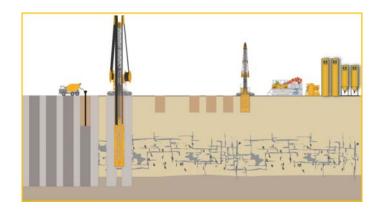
Principle – Installation of a double-phase concrete cut-off wall
